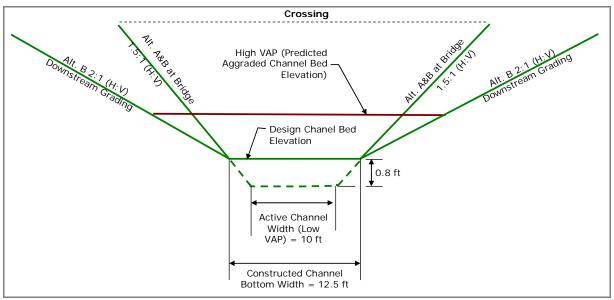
Proposed channel grading at the bridge and downstream for Alternatives A and B (vertically exaggerated). Under the bridge, the proposed channel side slopes are at 1.5:1 (H:V) and rip rapped. For Alternative B downstream of the bridge, channel side slopes are at 2:1 (H:V) and stabilized with vegetation. The toe of riprap and any scour control structures should be placed below the elevation of the low VAP.
